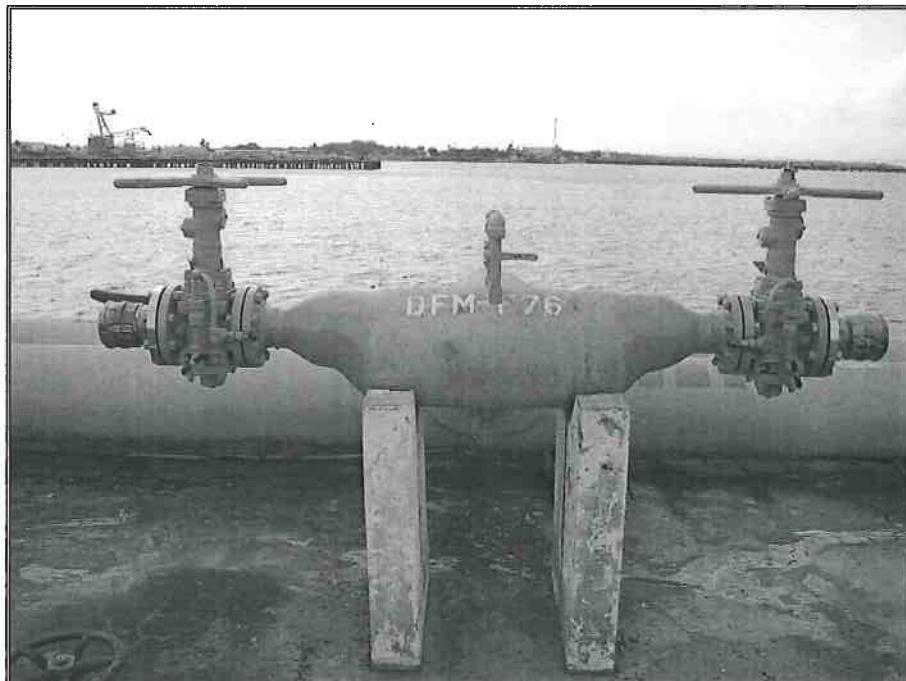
B – Pier 1 4-inch Barge Riser with 3/4-inch Vent
